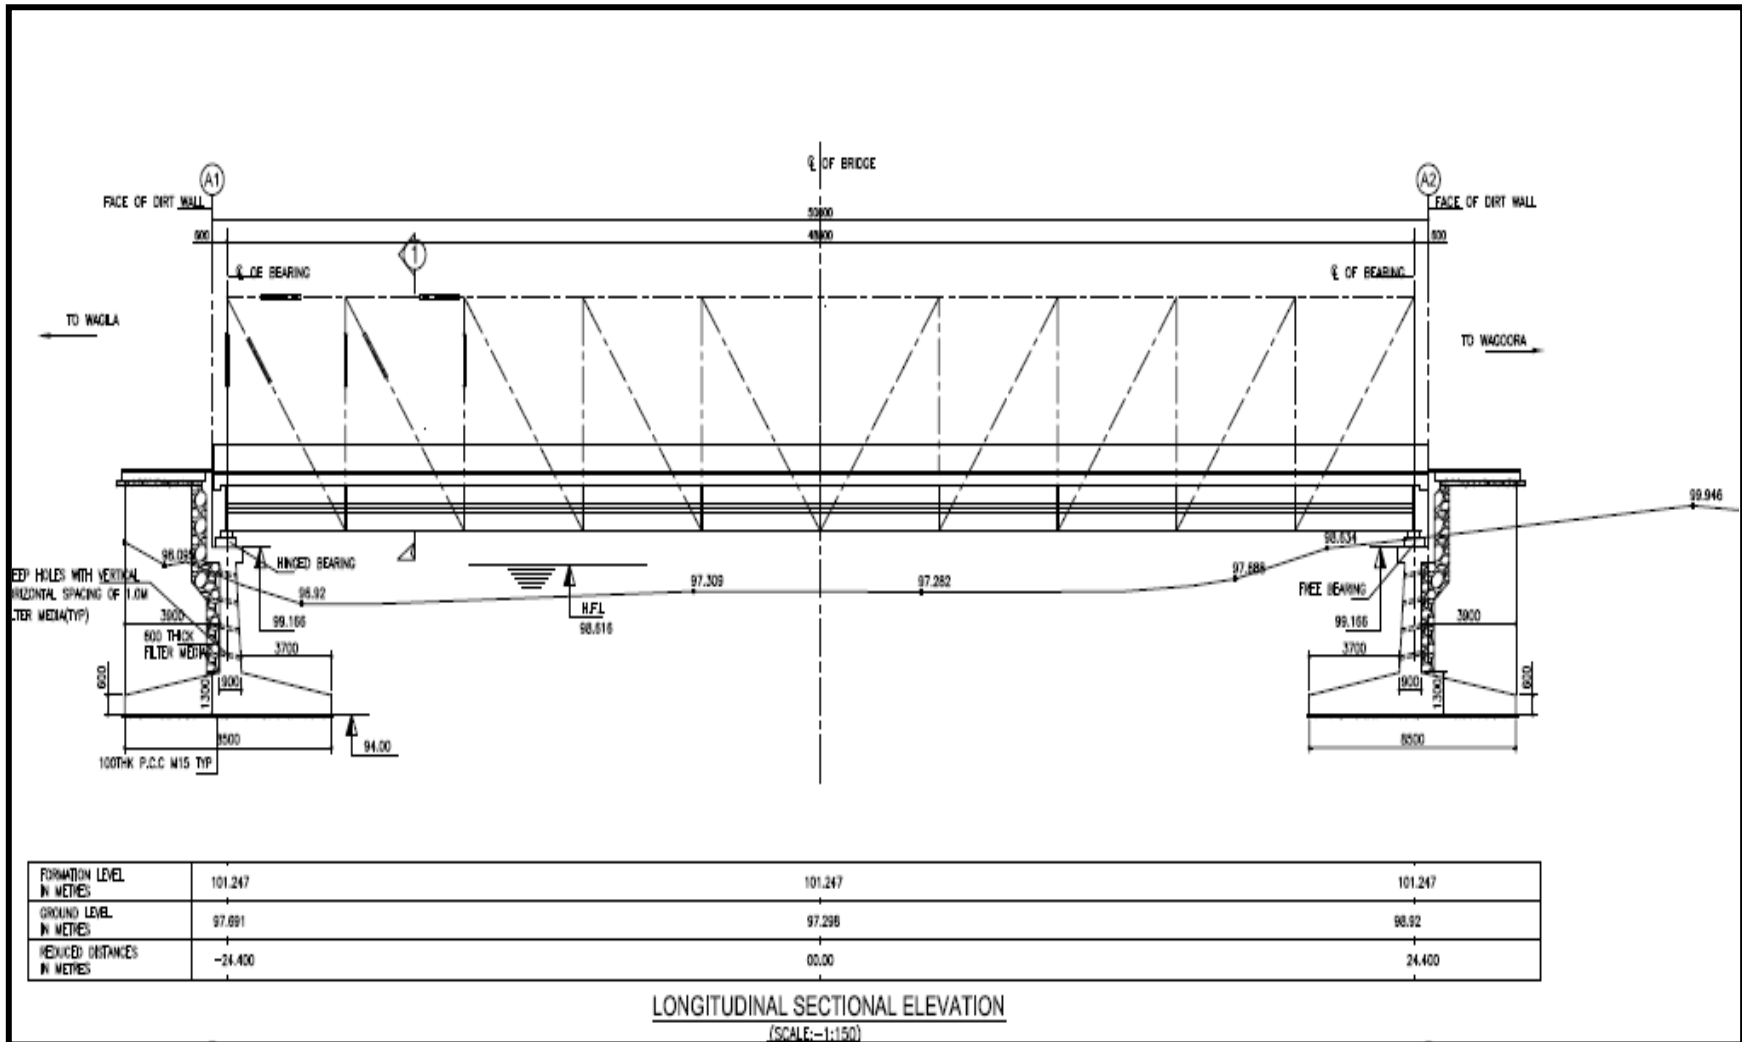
General Arrangement Drawing (GAD) for Proposed Bridge at Wagila Wagoora
